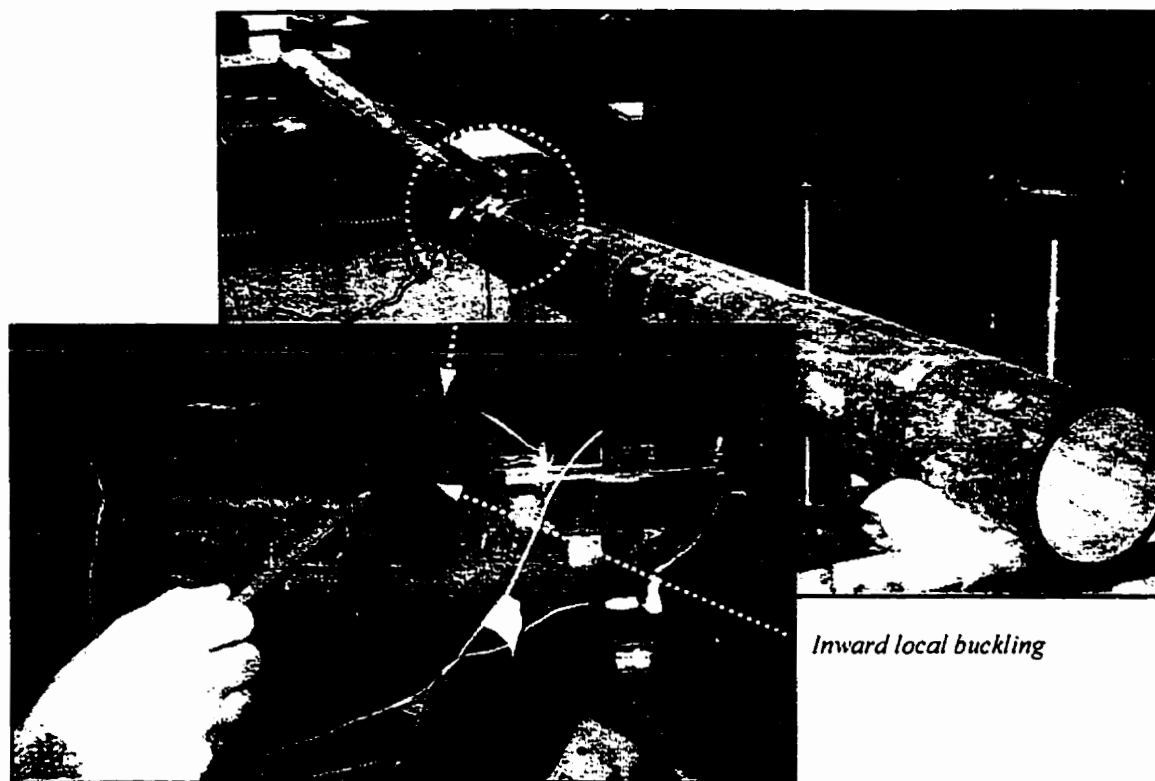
Failure mode of hollow steel tube, beam 1a
